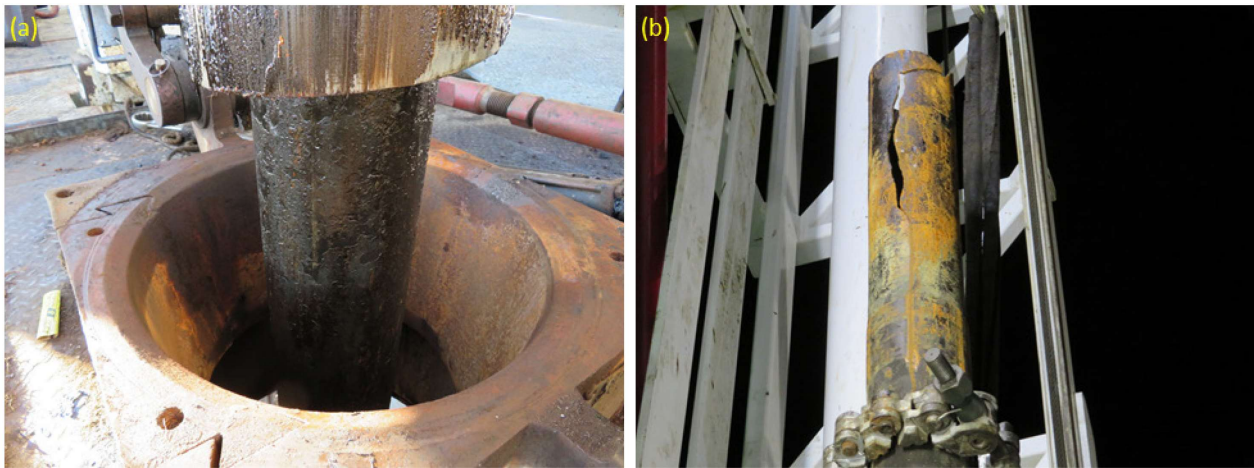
Lower Section of the Parted 7 in. Casing (a) In and (b) Out of the Pawl Tool
